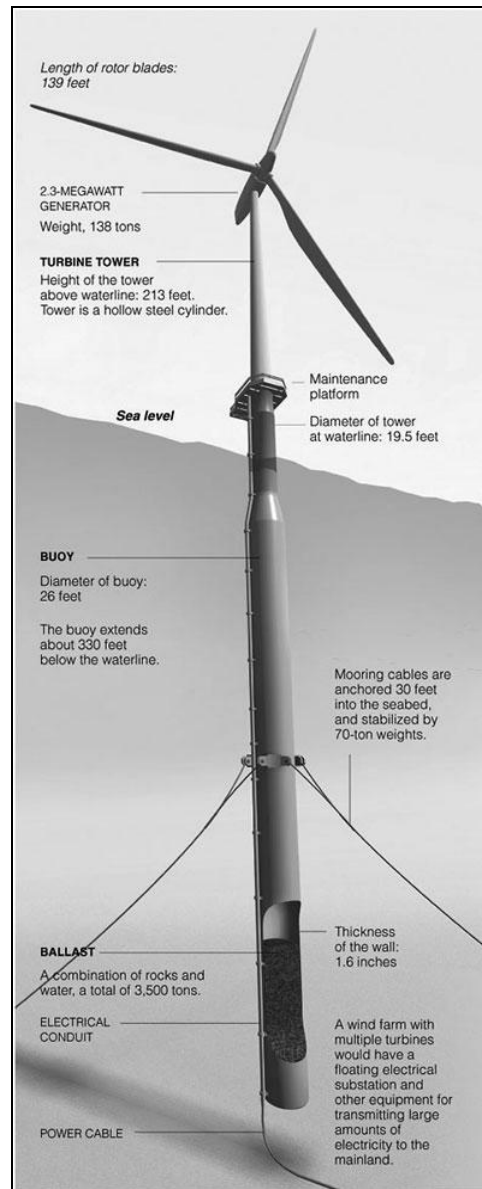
Detailed example of a floating foundation (NEW YORK TIMES, 2009)
